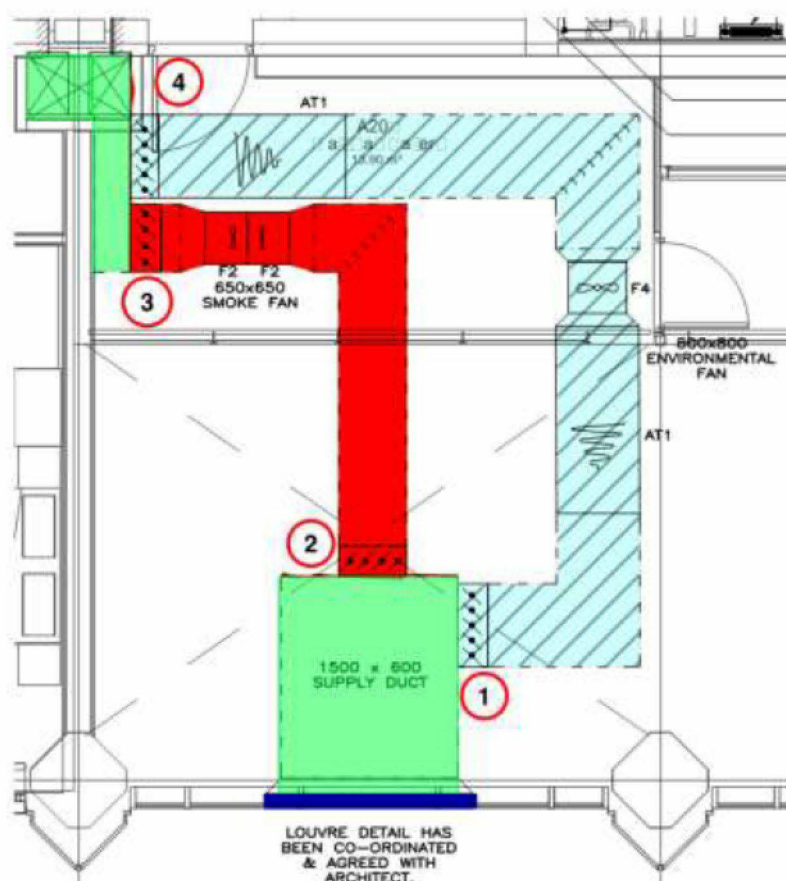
Layout of ductwork at Level 2. Light blue: environmental fan, dampers and ductwork. Red: smoke fans, dampers and ductwork. Green: shared ductwork,
